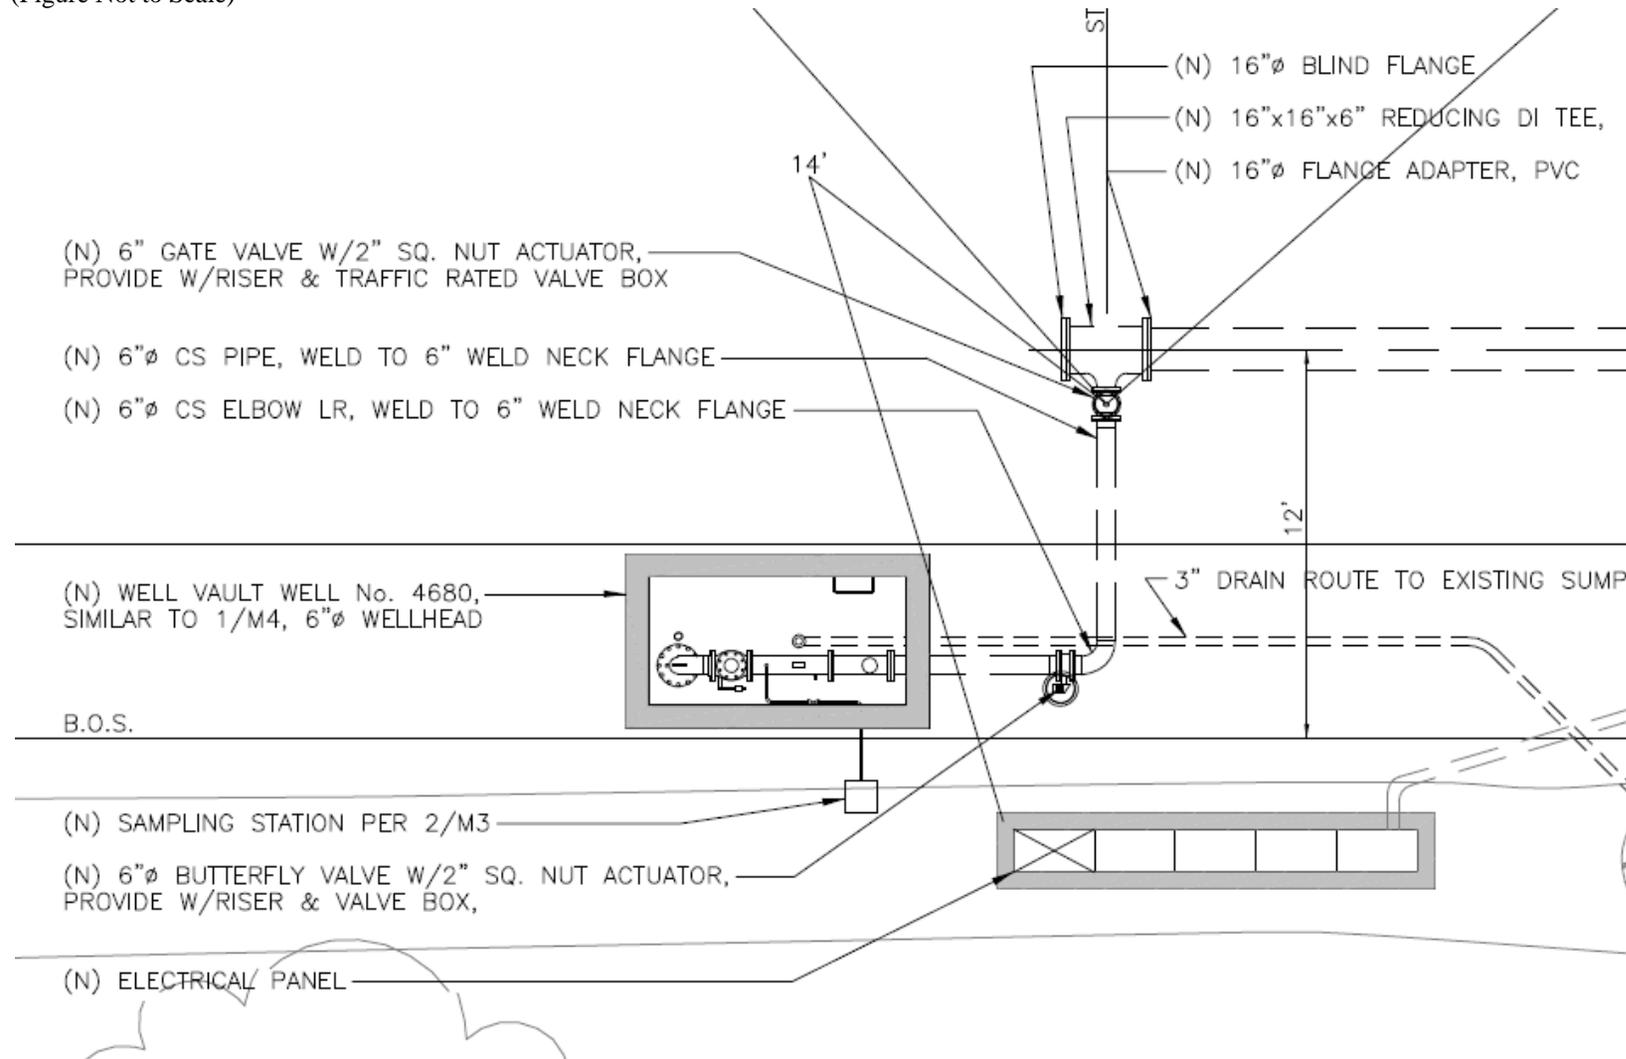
SECTION AND PLAN VIEWS, WELL 4680
